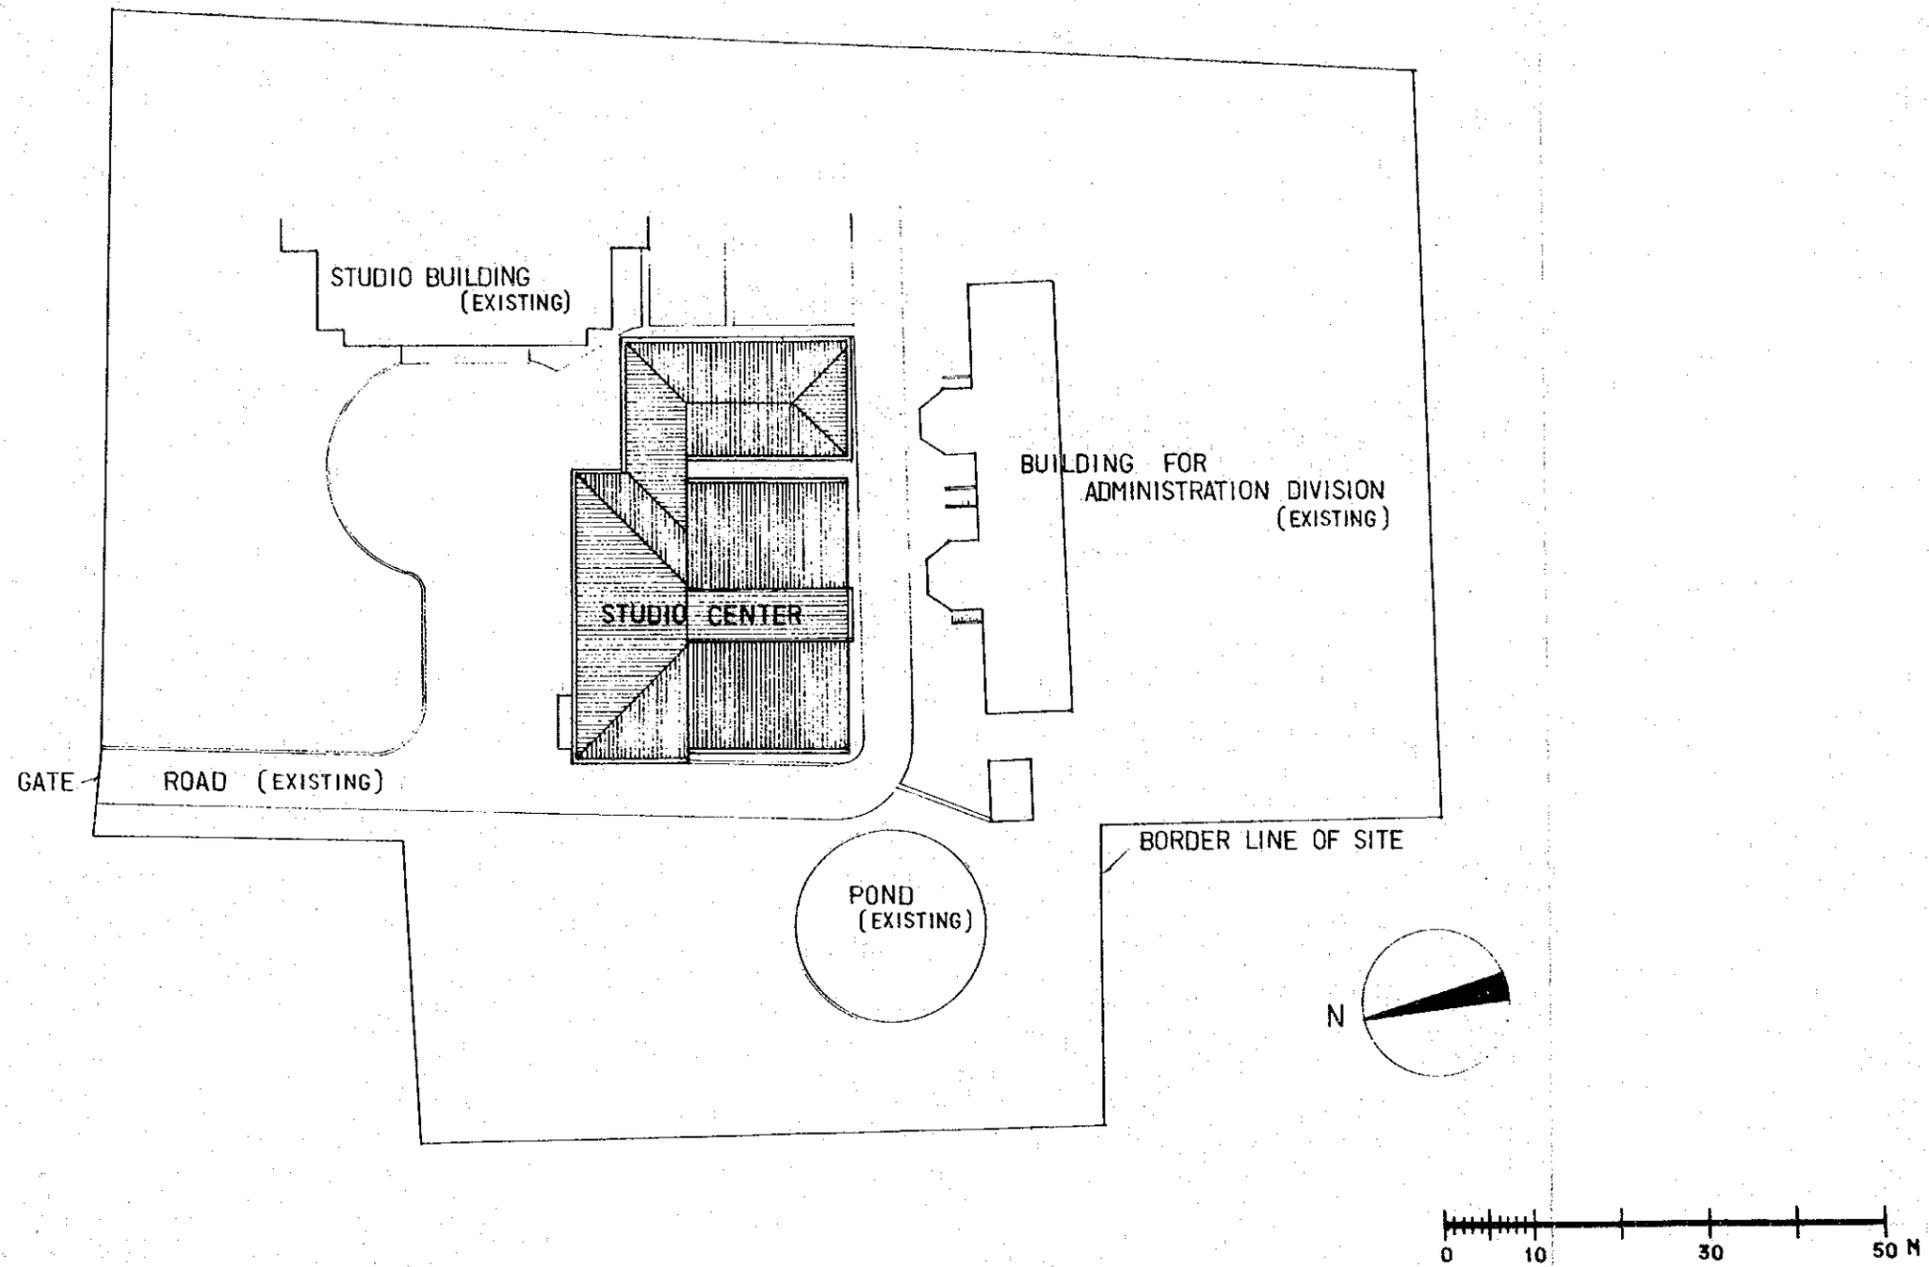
SITE PLAN — KATHMANDU STUDIO CENTER
